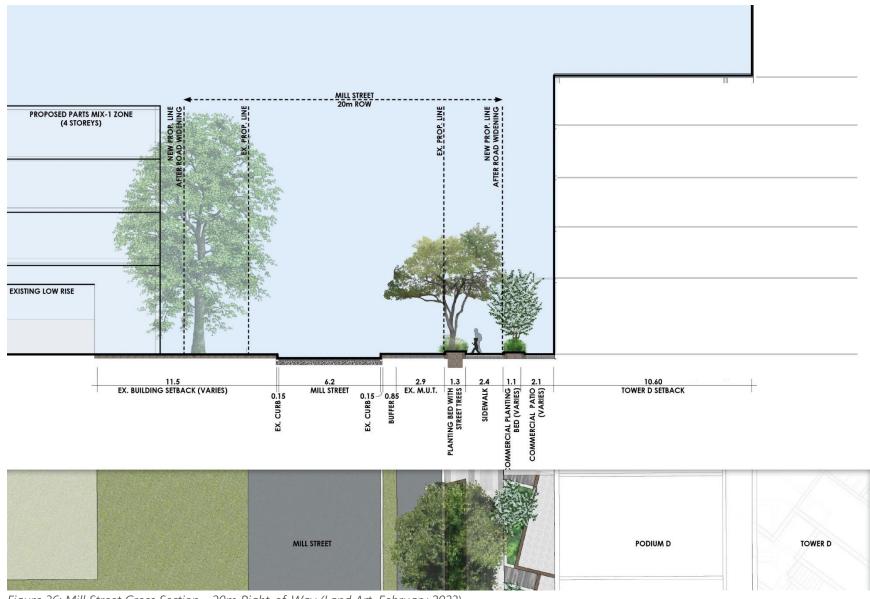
Mill Street Cross Section - 20m Right-of-Way (Land Art, February 2023)
